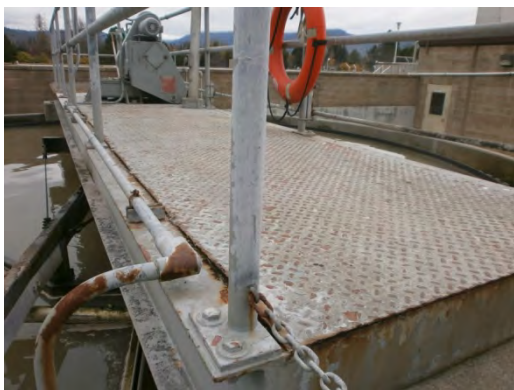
Walkway bridge shows signs of corrosion on conduits, guardrail, as well as the bridge structure.
